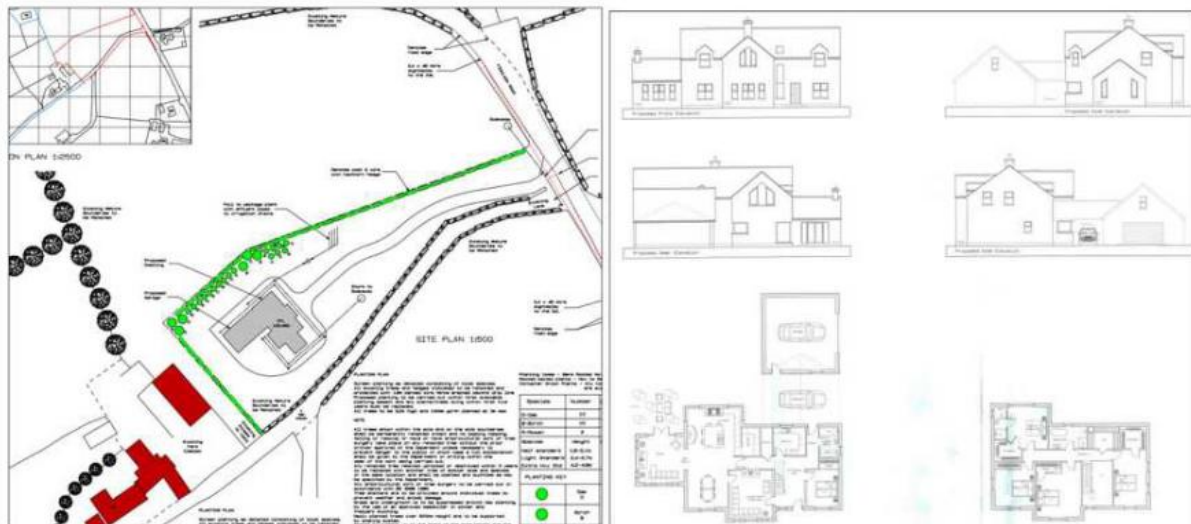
& 6: Proposed site layout; and floor plans and elevations of dwelling including garage, respectively.
